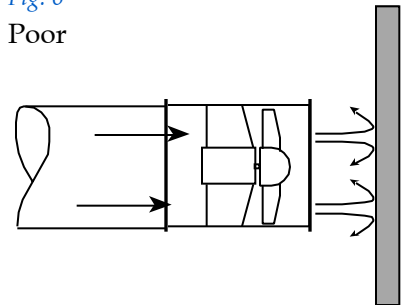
illustrates a poor installation with the fan located too close to a wall.
